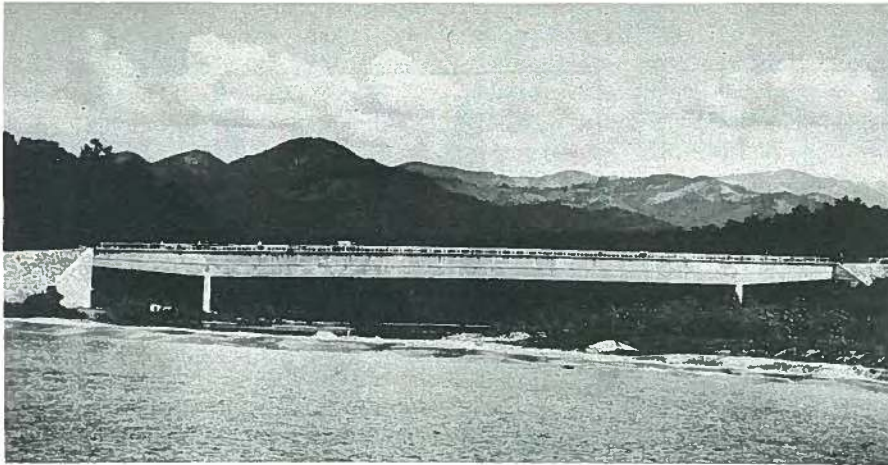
Canas Bridge, first prestressed box girder in Cuba. It spans 249 ft and has 50-ft anchor arms. Later designs resulted in more economical construction details and architectural improvements such as arched soffits.
